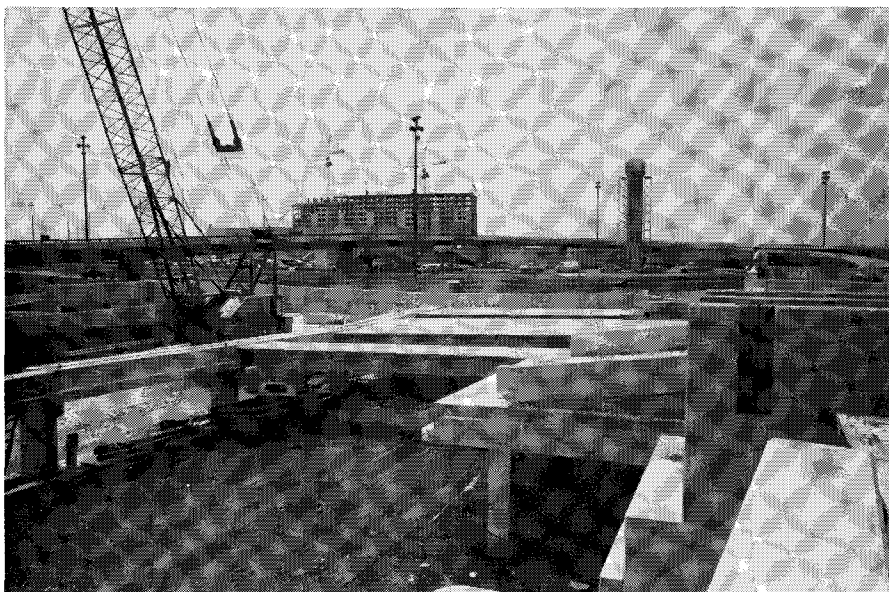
Precast double tees are topped with $3\frac{1}{2}$ in. cast-in-place slab post-tensioned with $\frac{1}{2}$ in. strand tendon to produce a 200-psi compression perpendicular to span of tees.
